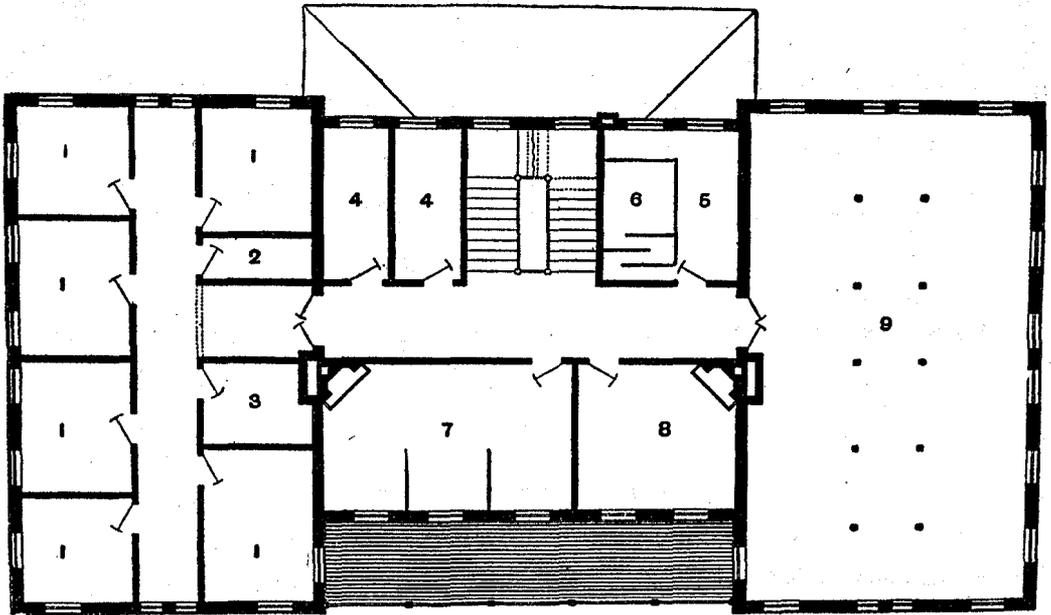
Plan of second floor of laboratory building. 1, Six bed chambers; 2, linen closet; 3, janitor's closet; 4, two bathrooms; 5, photographic room; 6, dark room; 7, north laboratory; 8, director's laboratory; 9, west wing.
